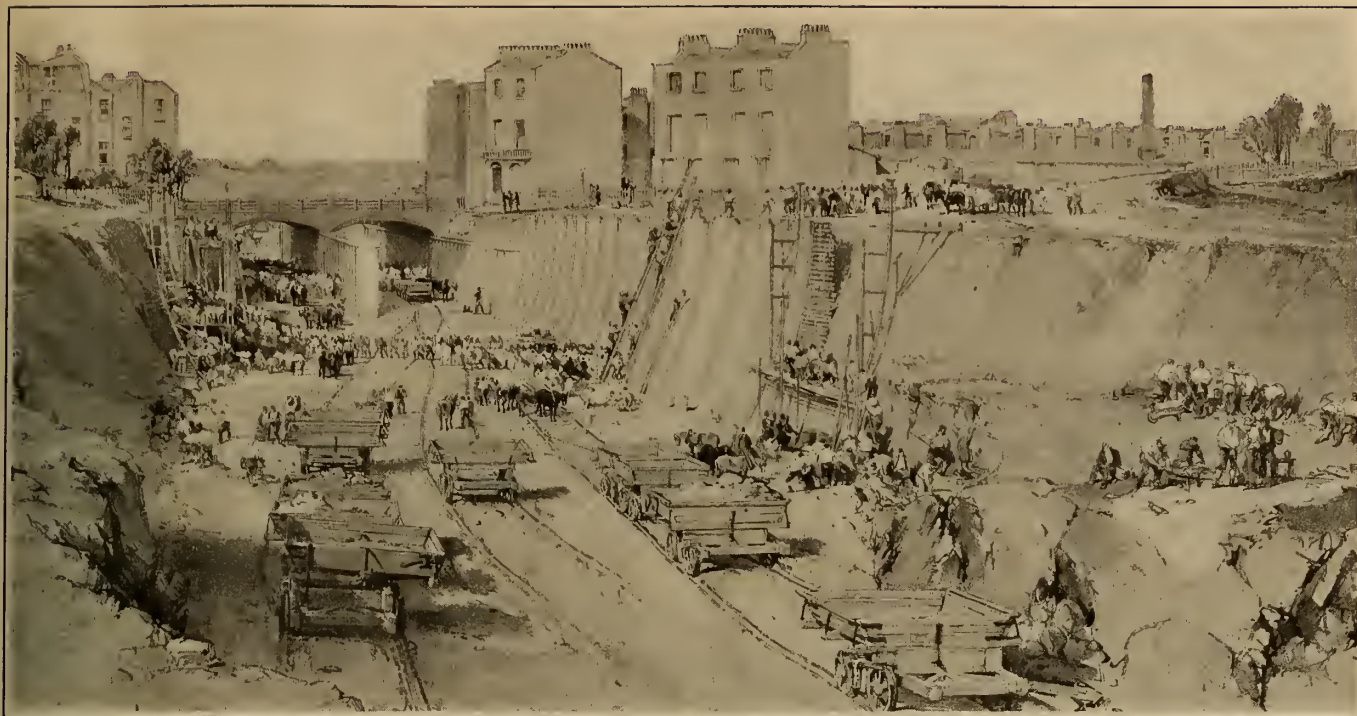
BUILDING RETAINING WALLS, PARK STREET, CAMDEN TOWN, SEPTEMBER 17, 1836
